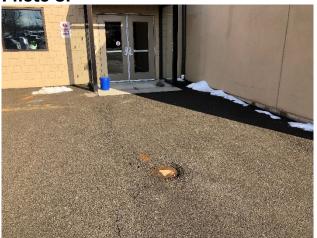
Asphalt final cover along front of Site, Orchard Park Road at left (looking
